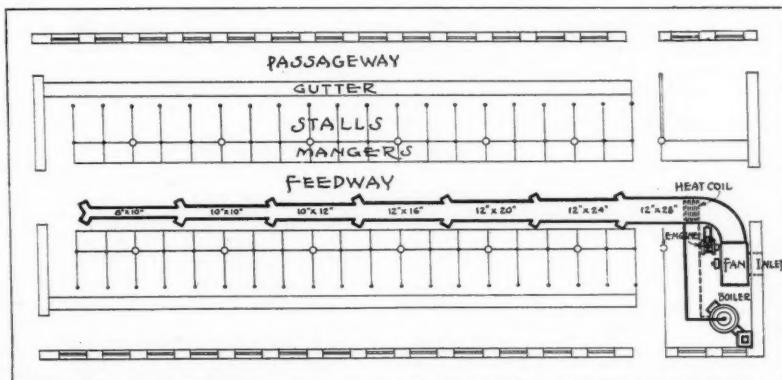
Plan view of dairy barn provided with combination of warm air heating from steam coil and forced draft ventilation
